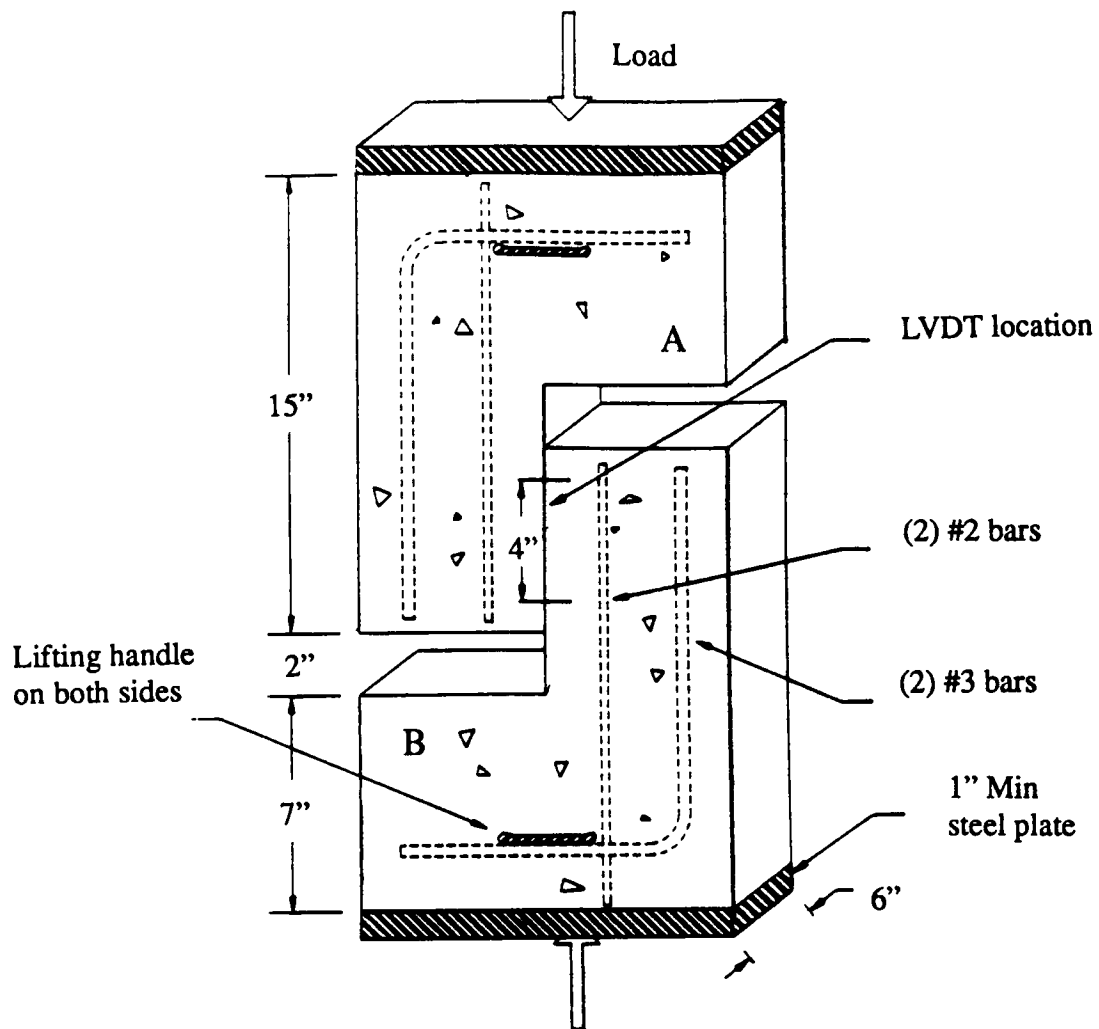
Specimen for the Concrete-to-Concrete Bond Test
